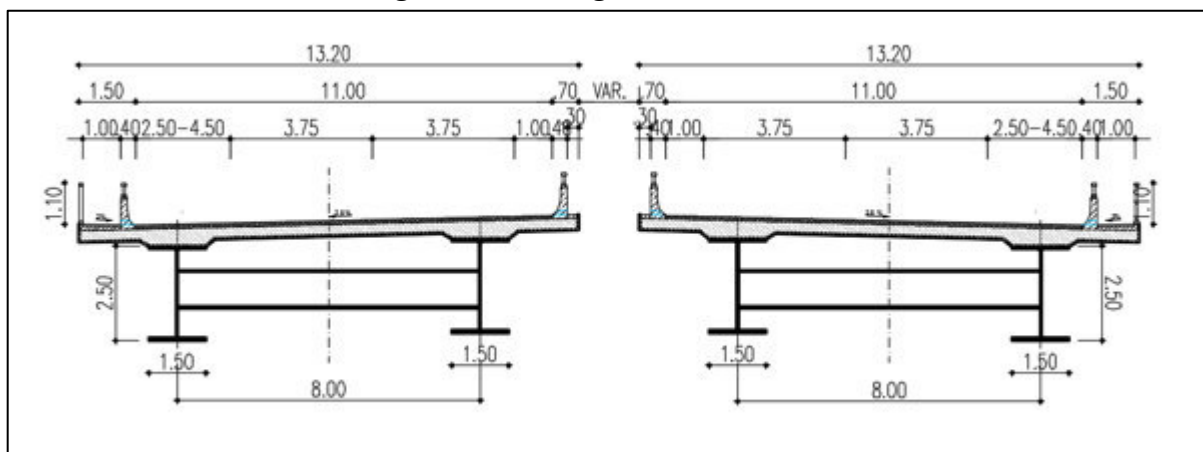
For pre-stressed precast PSC beams bridges – type 2
